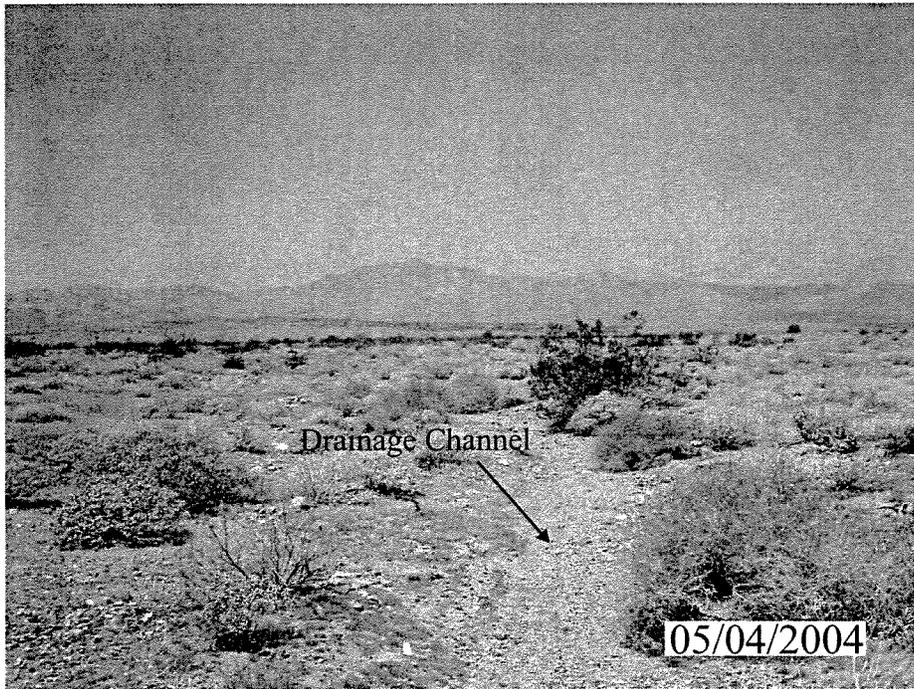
Typical view of the site, facing northwest. Note the drainage channel located in the foreground.
